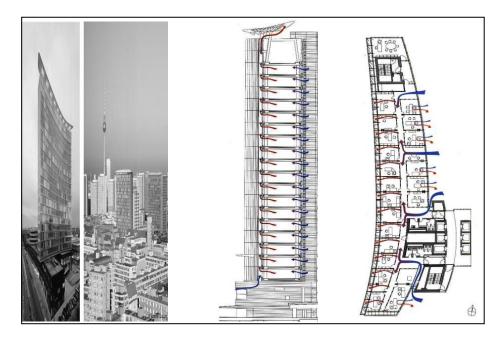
21: GSW Tower, section and plan with the thermal flue on the west (Salib & Wood, 2013)
